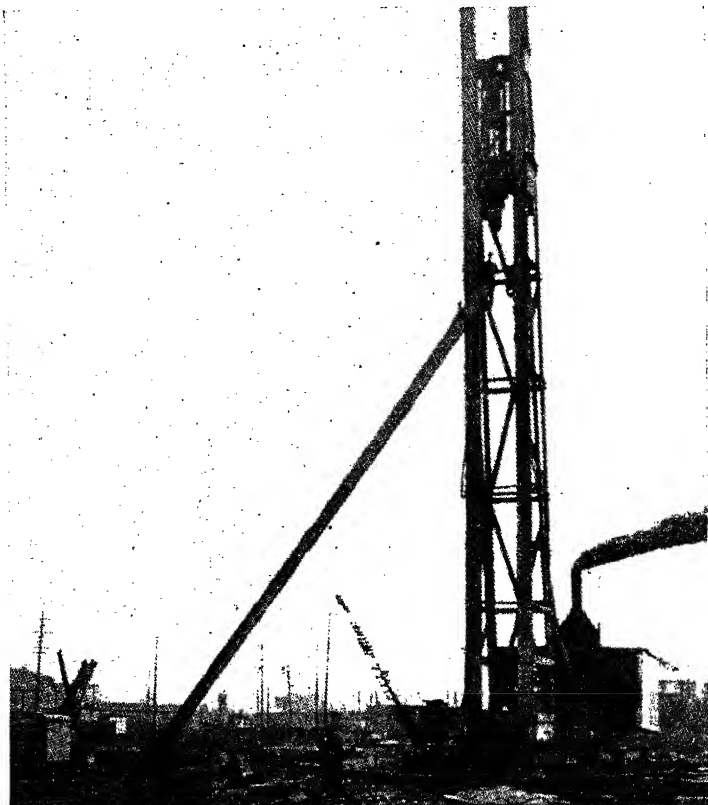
Sixty-foot monotube pile being placed in leads.
